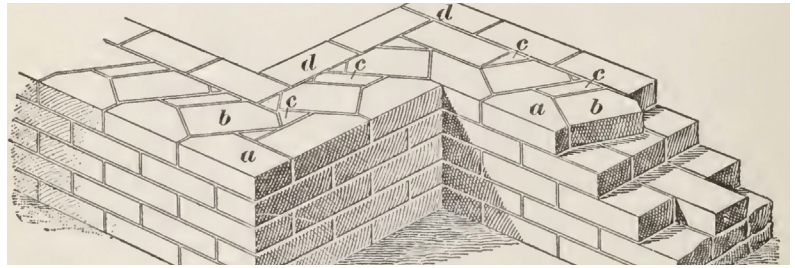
Historical drawing of three-wythe wall construction with blind headers, also known as diagonal or herring-bone bond. (A TEXTBOOK ON ARCHITECTURE AND BUILDING CONSTRUCTION, 1899)
